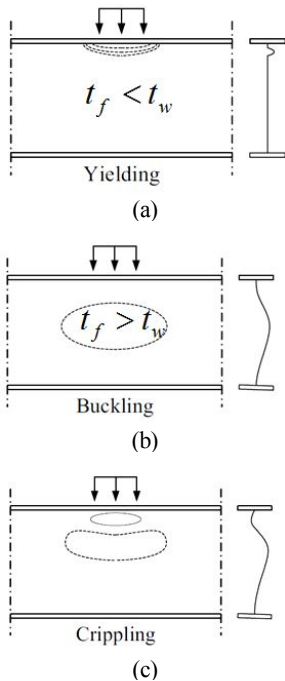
Failure mode of a slender plate girder subjected to patch loading: (a) Yielding, (b) Buckling, (c) Crippling.
